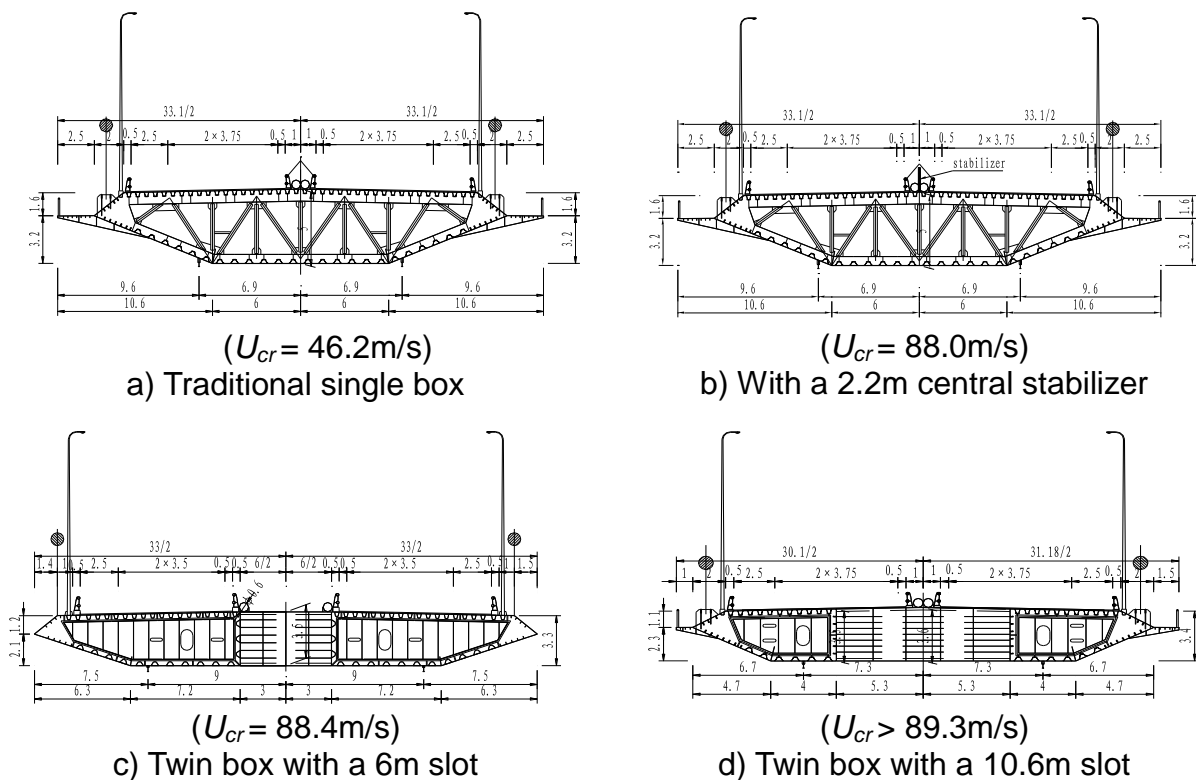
Alternative box-girder sections for Xihoumen Bridge
